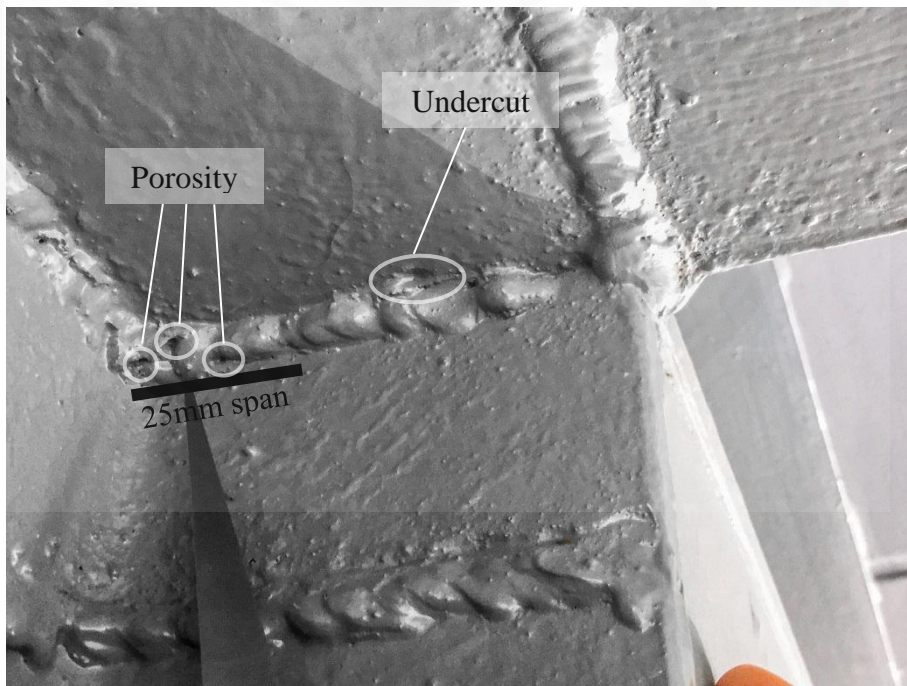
Welding defects on Steel Structure A (joint 8)
